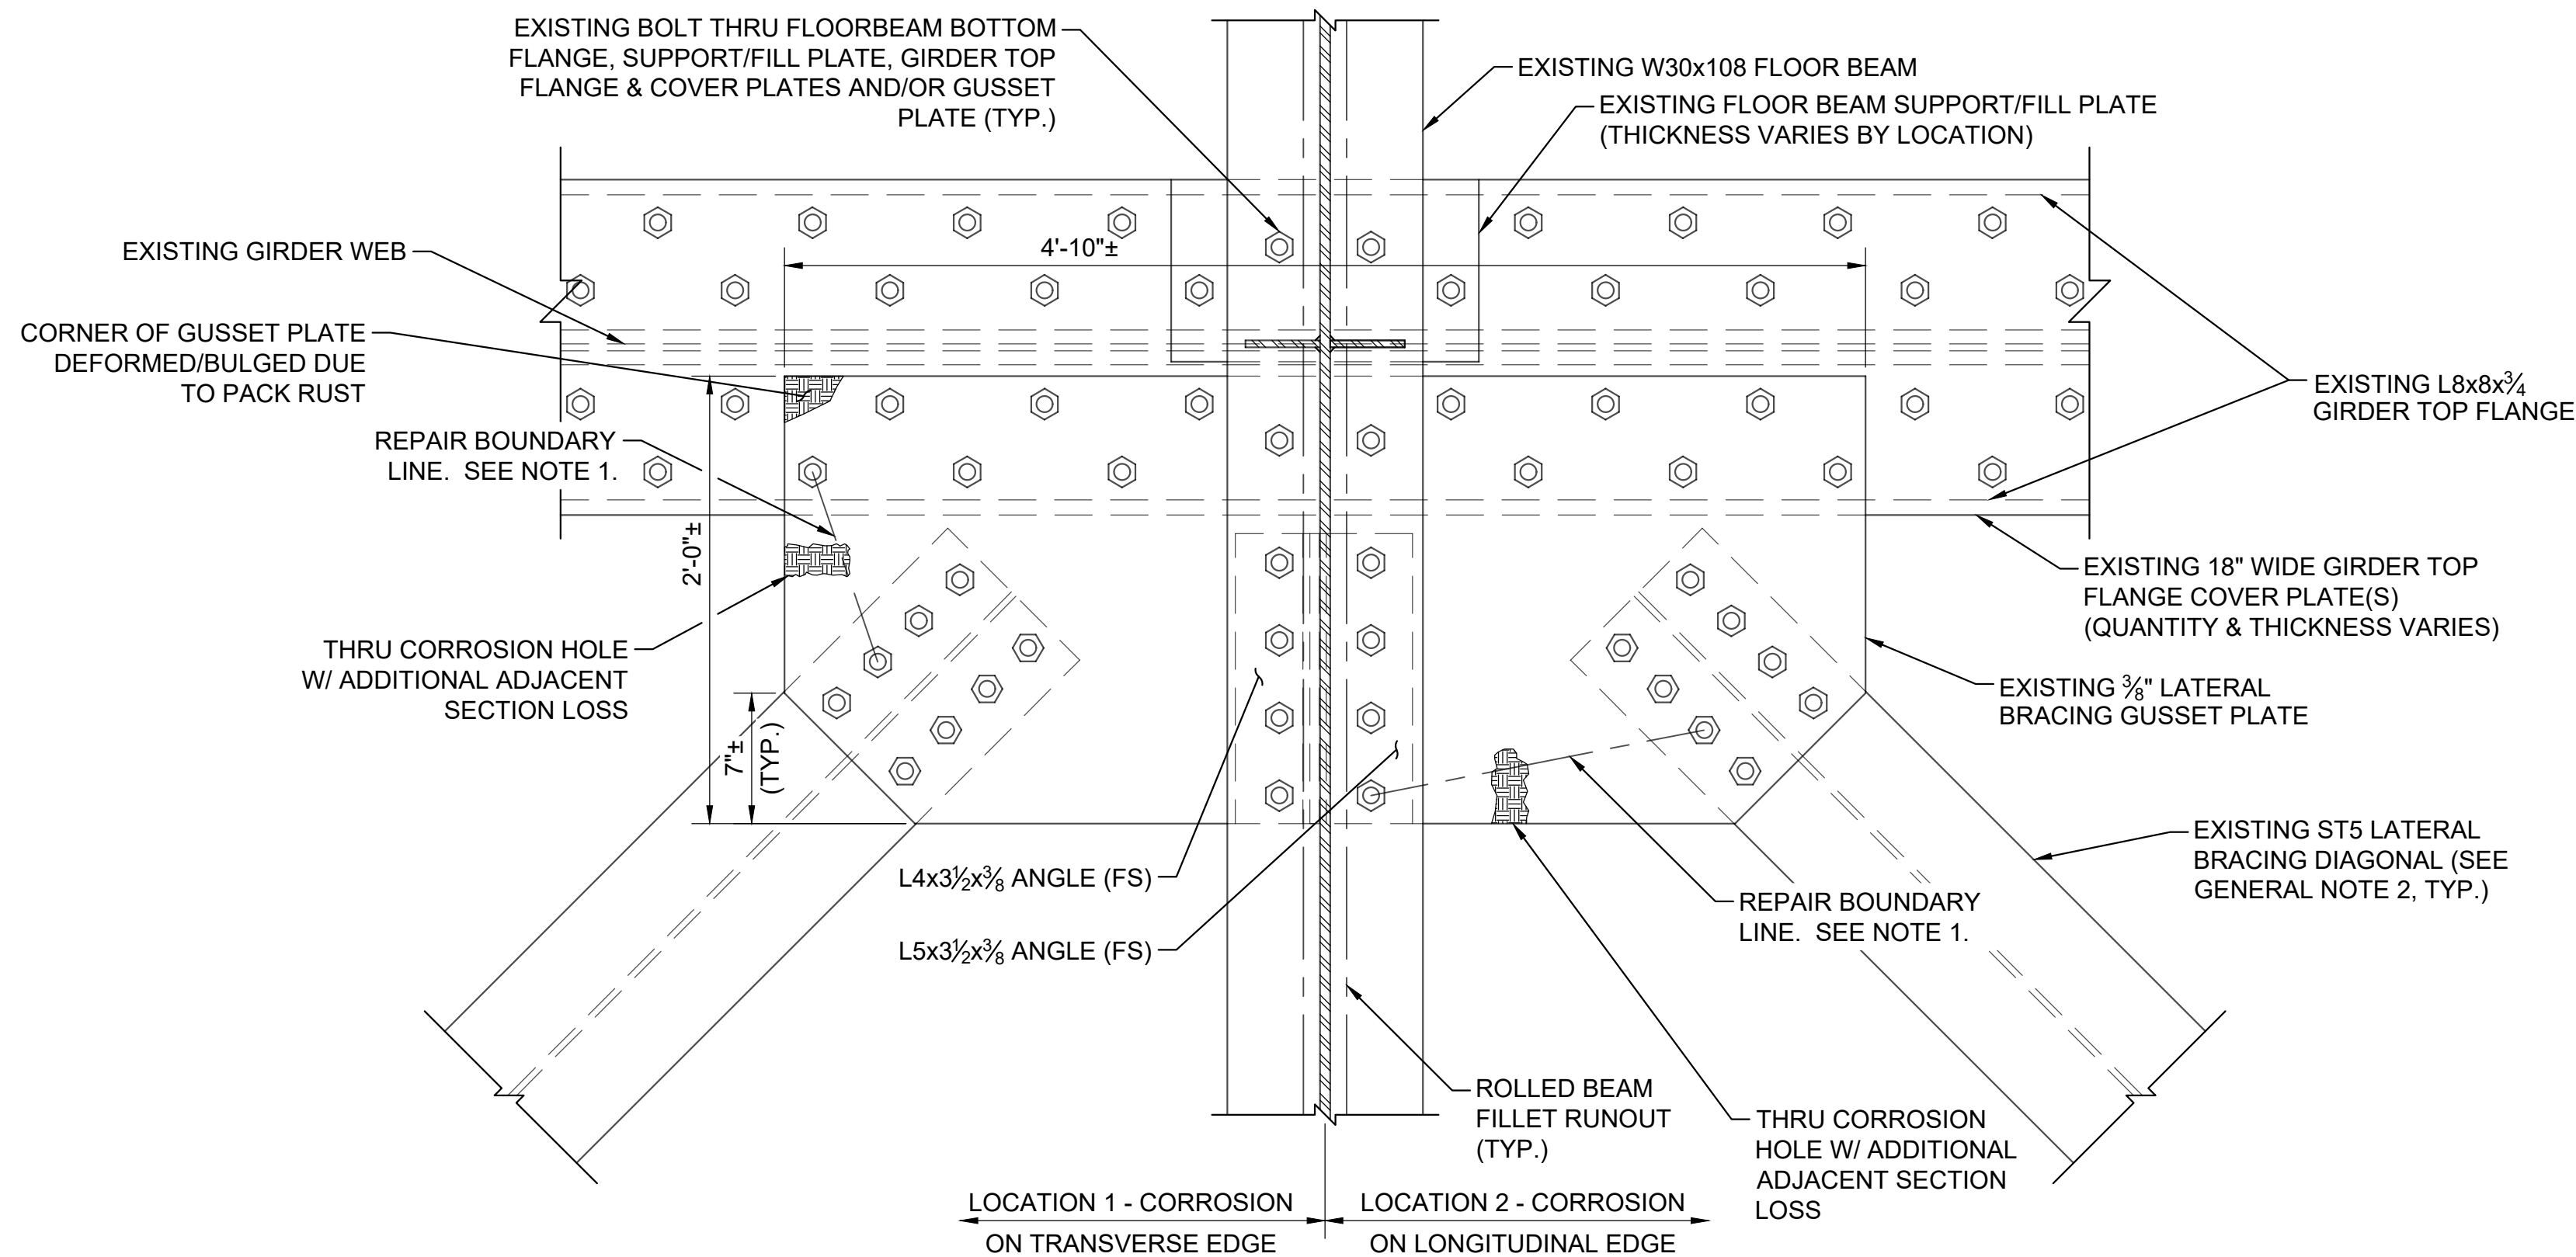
### DETAIL-SPECIFIC NOTES (NCB-NB BRACING REPAIR TYPE 3)
